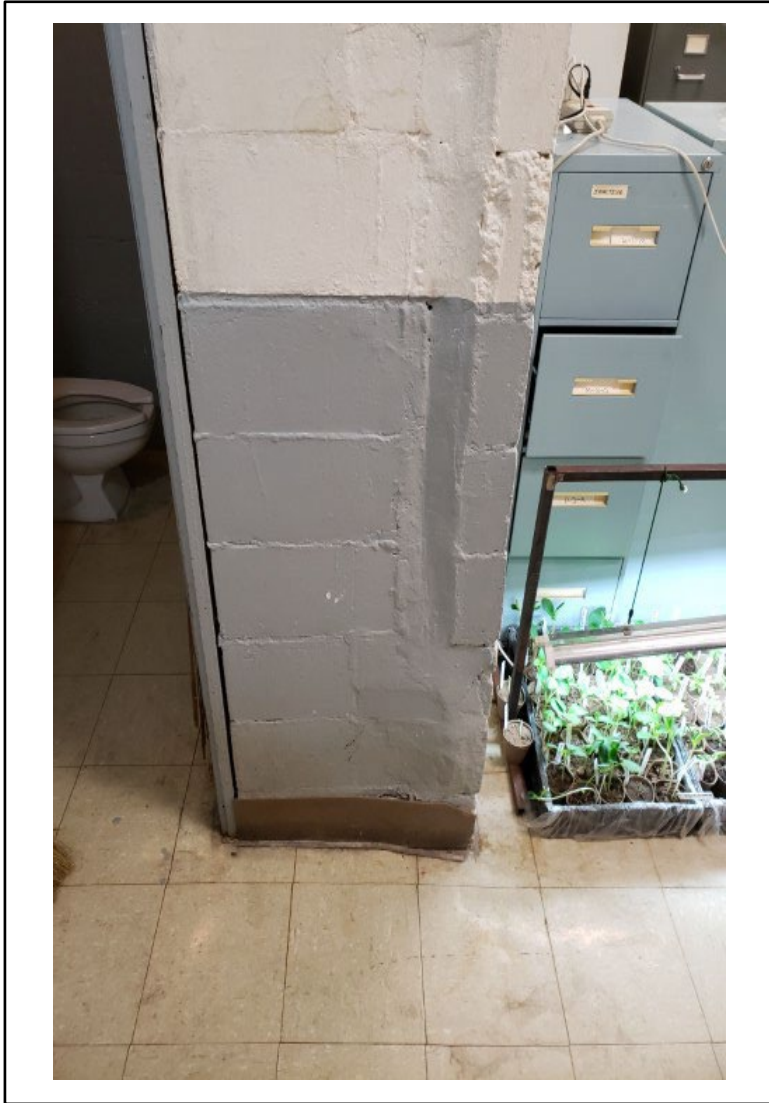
16 & 24 - Blue cinder block wall outside of bathroom
